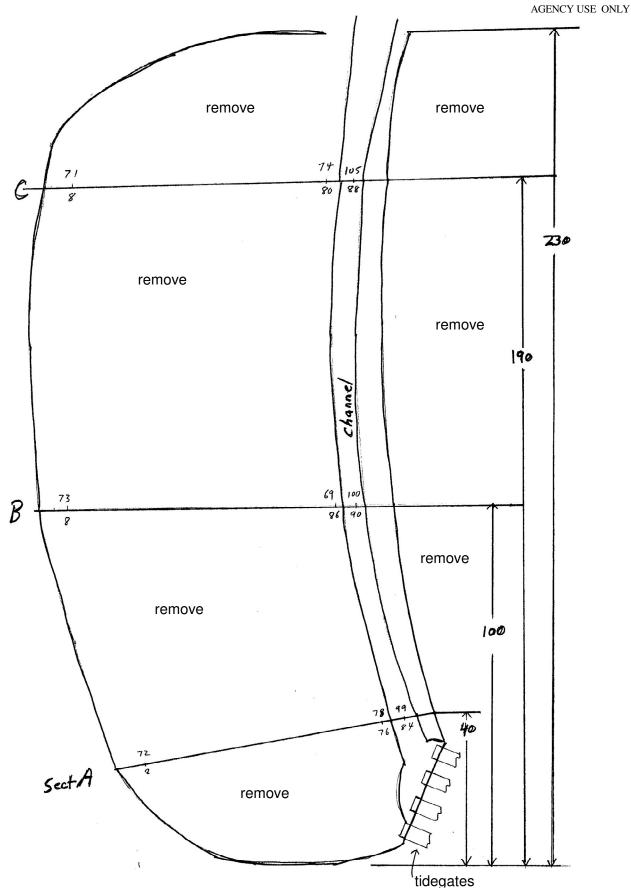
Tidegate Complex 35 – Site Plan and cross-section locations.
